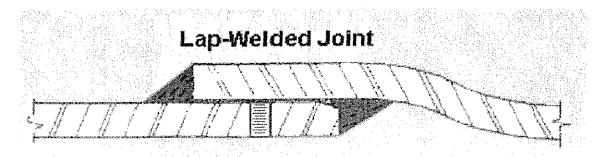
Lap-Weld joint for steel pipe, shown with inside and outside fillet welds and with air test port.
